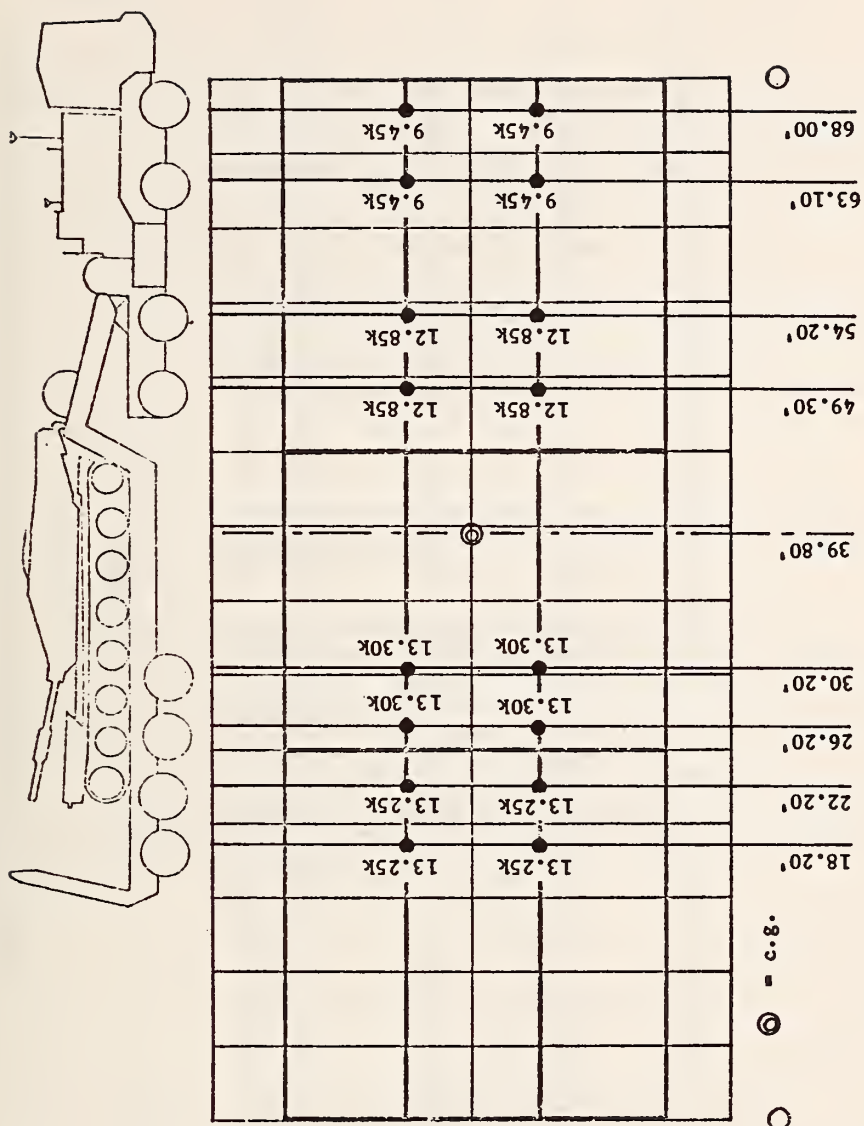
LOAD CONDITION 2, BRIDGE 1. CENTER OF GRAVITY OF HET-70 WHEEL LOADS PLACED TO SATISFY SIMPLE BEAM CRITERIA AT CENTERLINE OF 70' SPAN.
